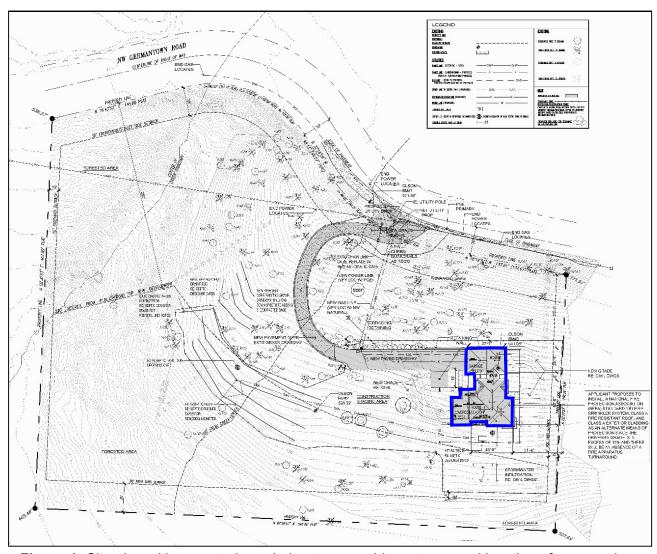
Site plan with property boundaries, topographic contours and location of proposed home footprint (outlined in solid blue) (base drawing source: Site Plan, A1.0, by Karina E. Adams Architect, dated November 10, 2021).
